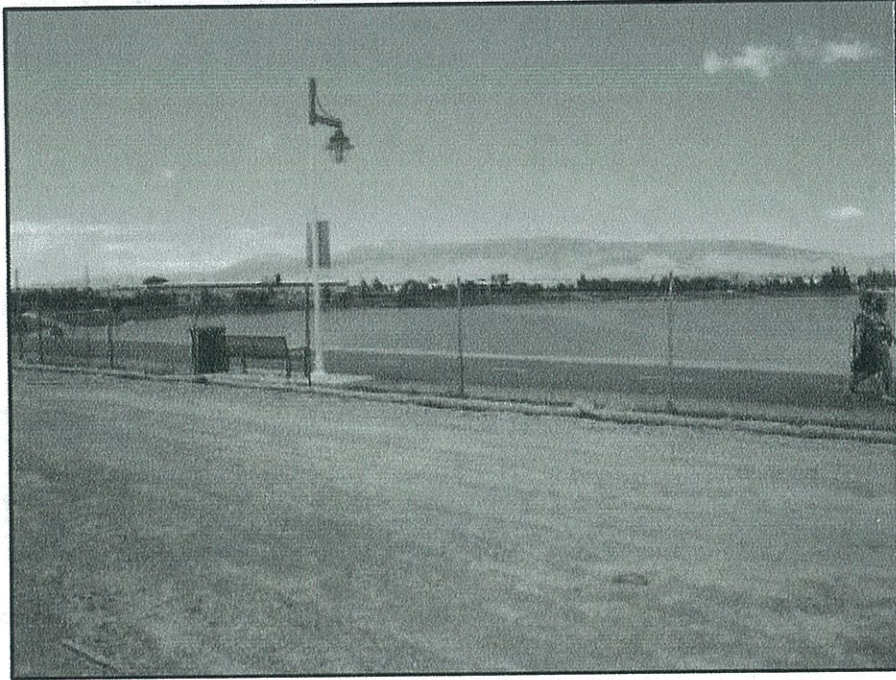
Looking southwest on the IMAX construction site. Note the straw wattle along the perimeter of the portion of the site. The wattle was entrenched and staked down.
